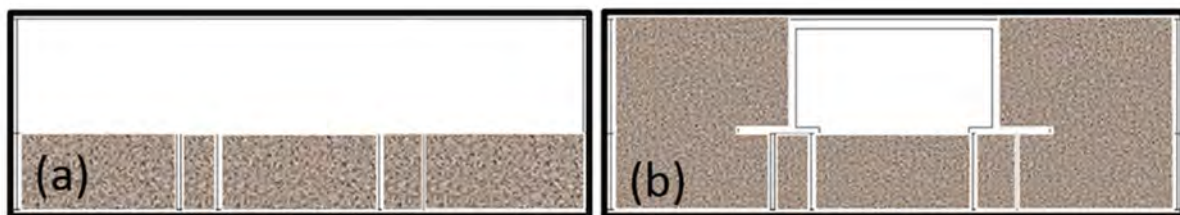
Shear stack filled (a) 400 mm (b) 600 mm additional fill to the level of the deck
